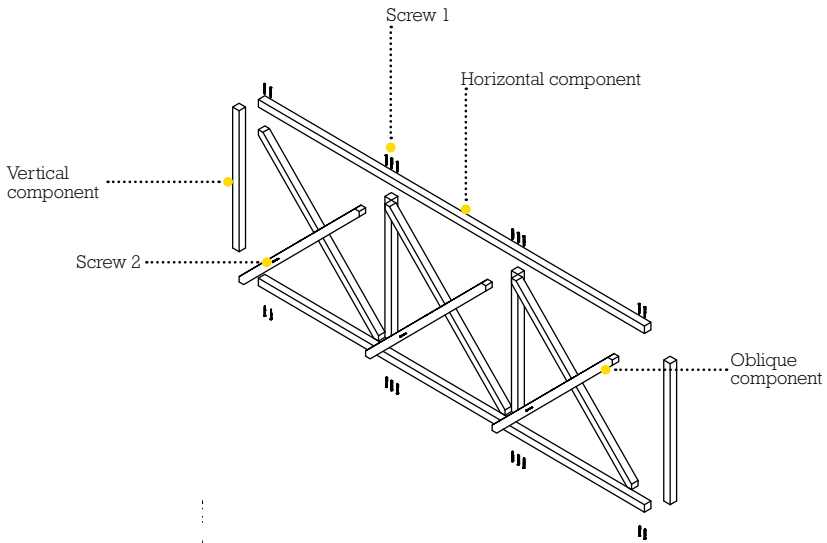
Construction detail - Main components of the outfitting structure | Axonometric exploded view.
